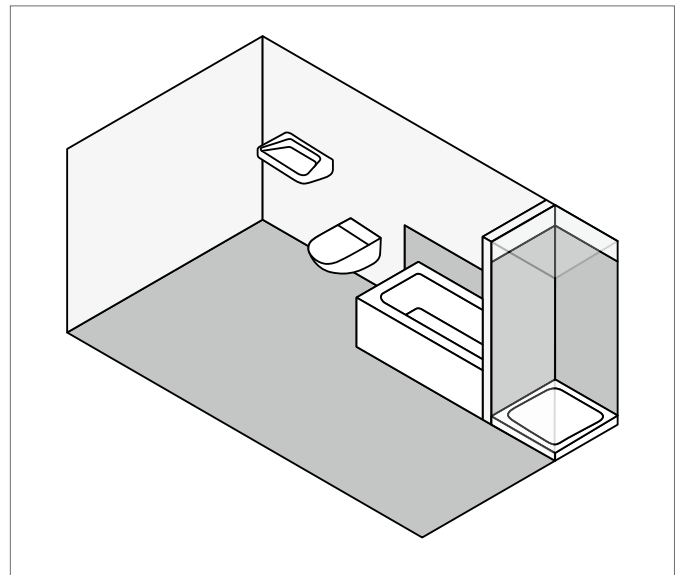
Bathtub without shower, shower tub with shower wall sealed against moisture ingress
